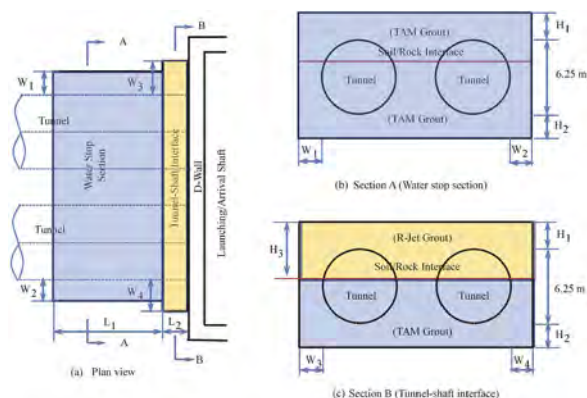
Grouting plan and profile for launching and arrival shield of the study case (Chen et al.,2020).
